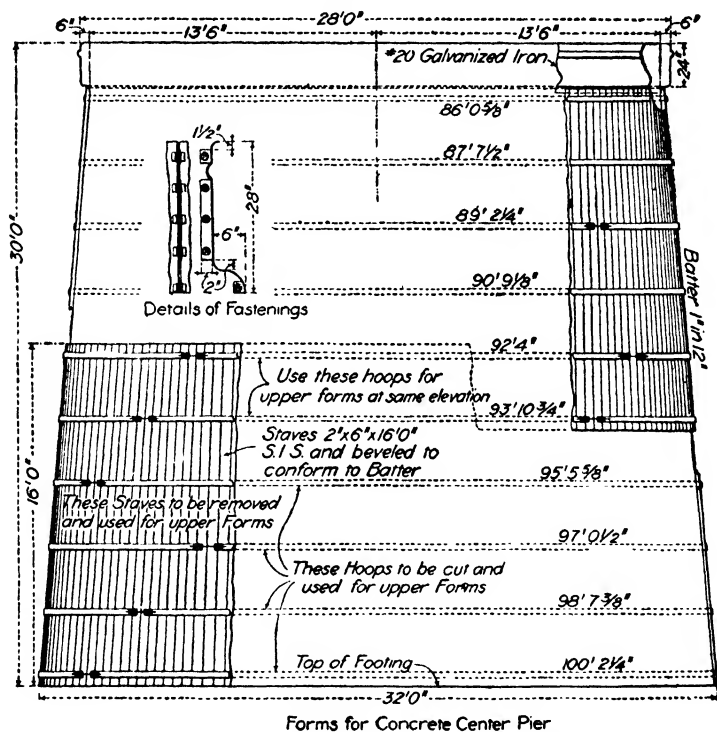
Form for Constructing Concrete Pivot Pier.
